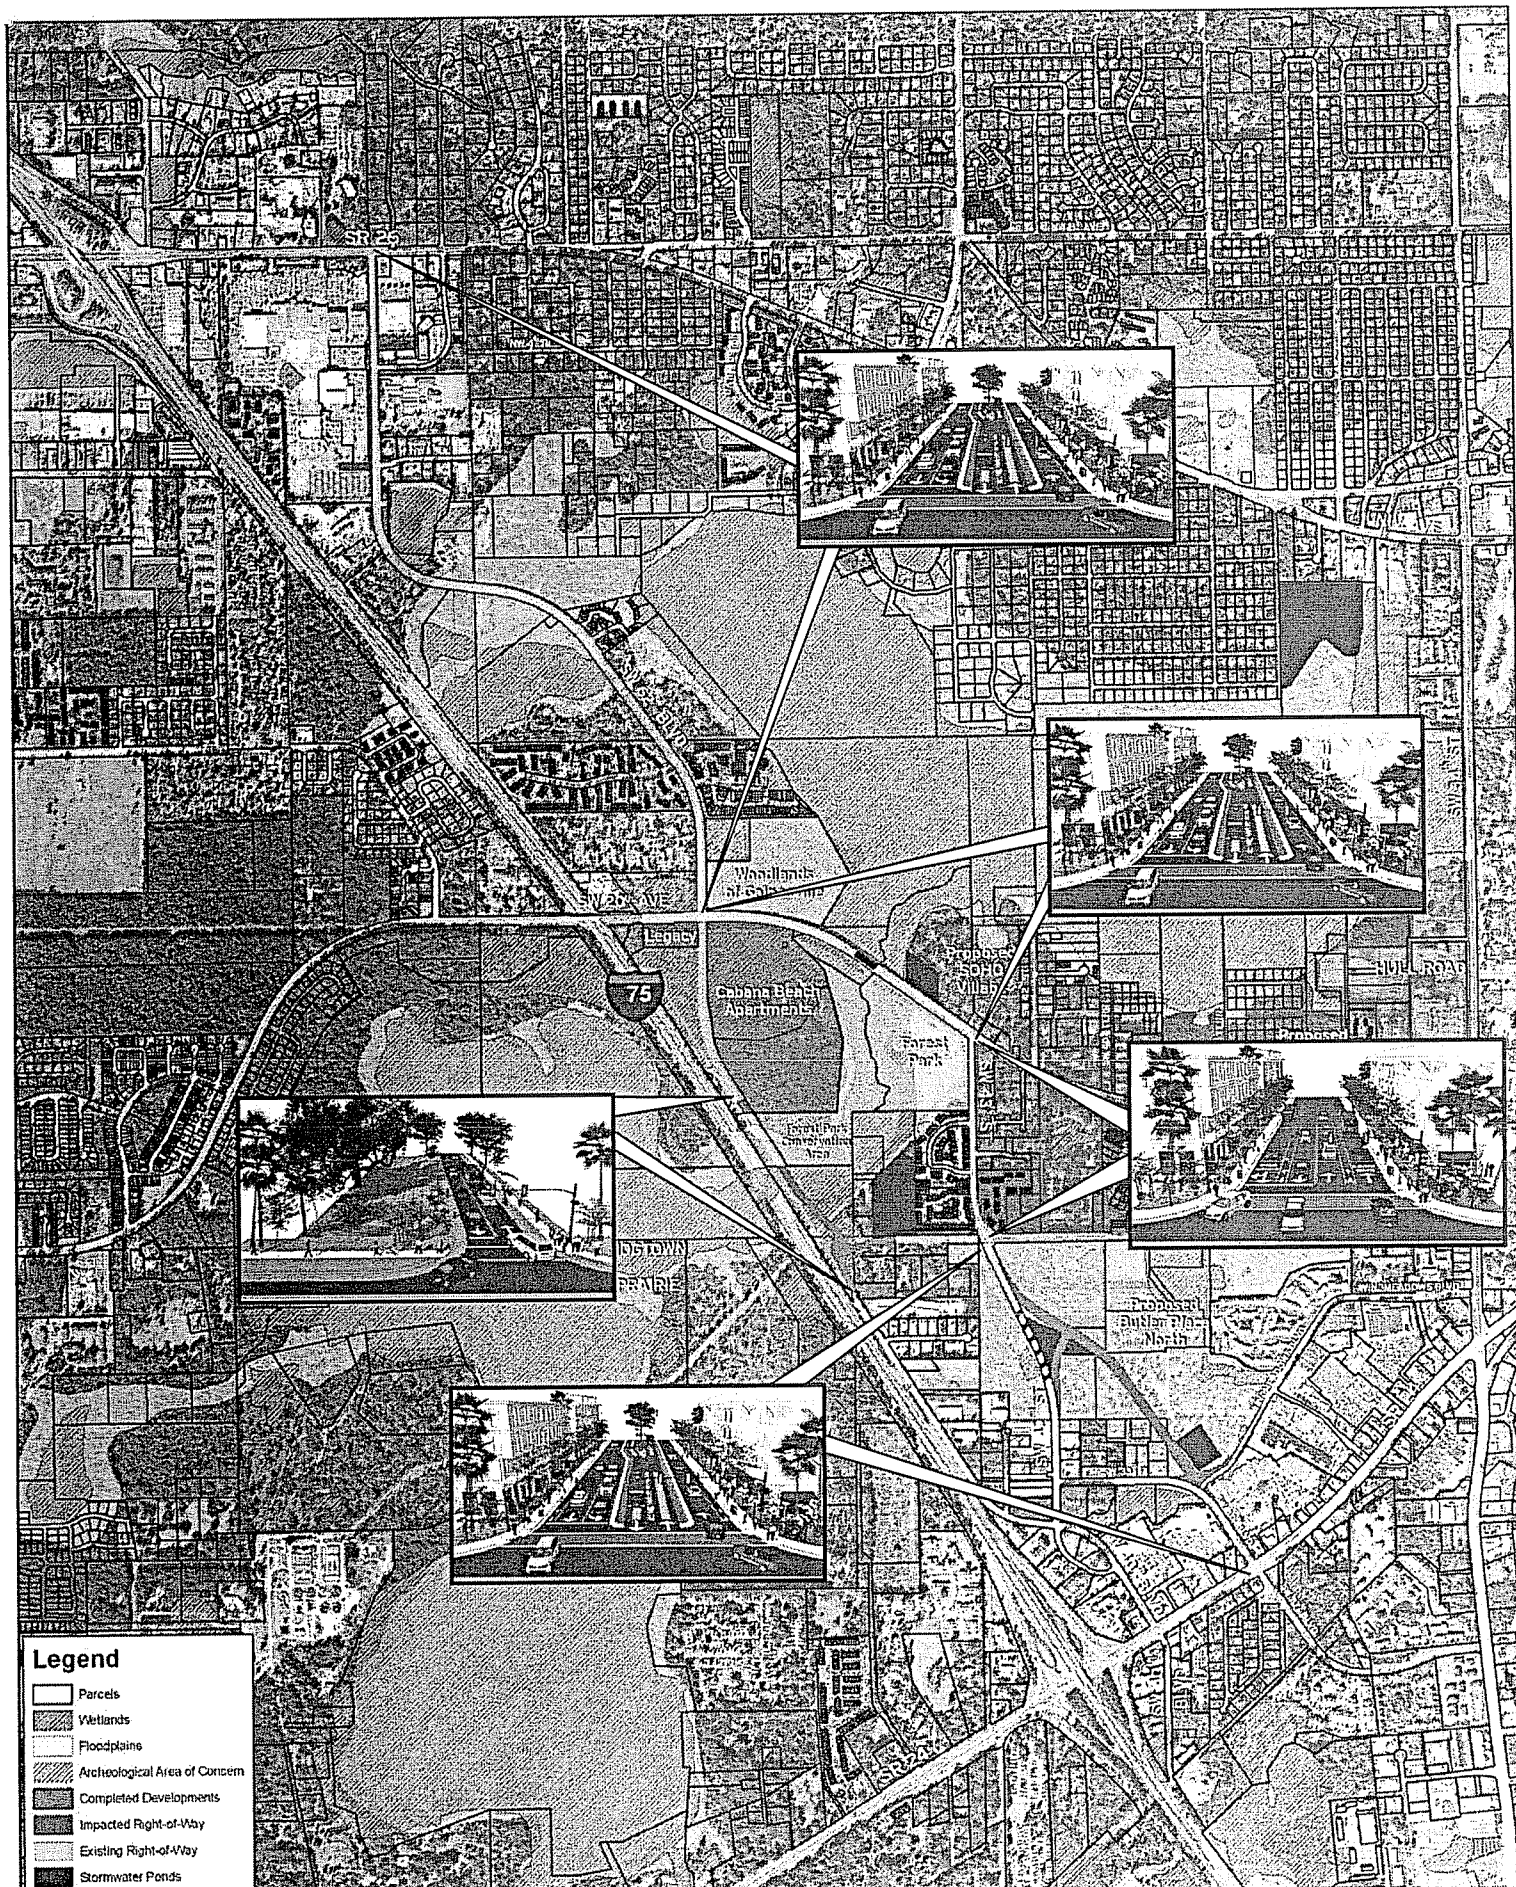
Alternative Alignment 4B-2 with Four-Lane Urban Typical Section
